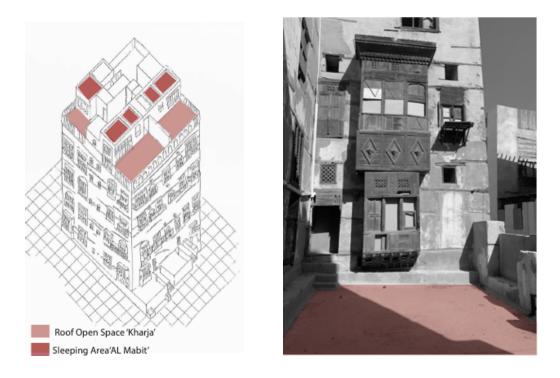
Right, showing more than one roof open space as well as sleeping spaces on the top floor of Al Hazazi House (Hariri & Sultan, 1995, p. 55). Left, Jamjoom House. Open space, *kharja*, situated on the second floor. Taken by author.
